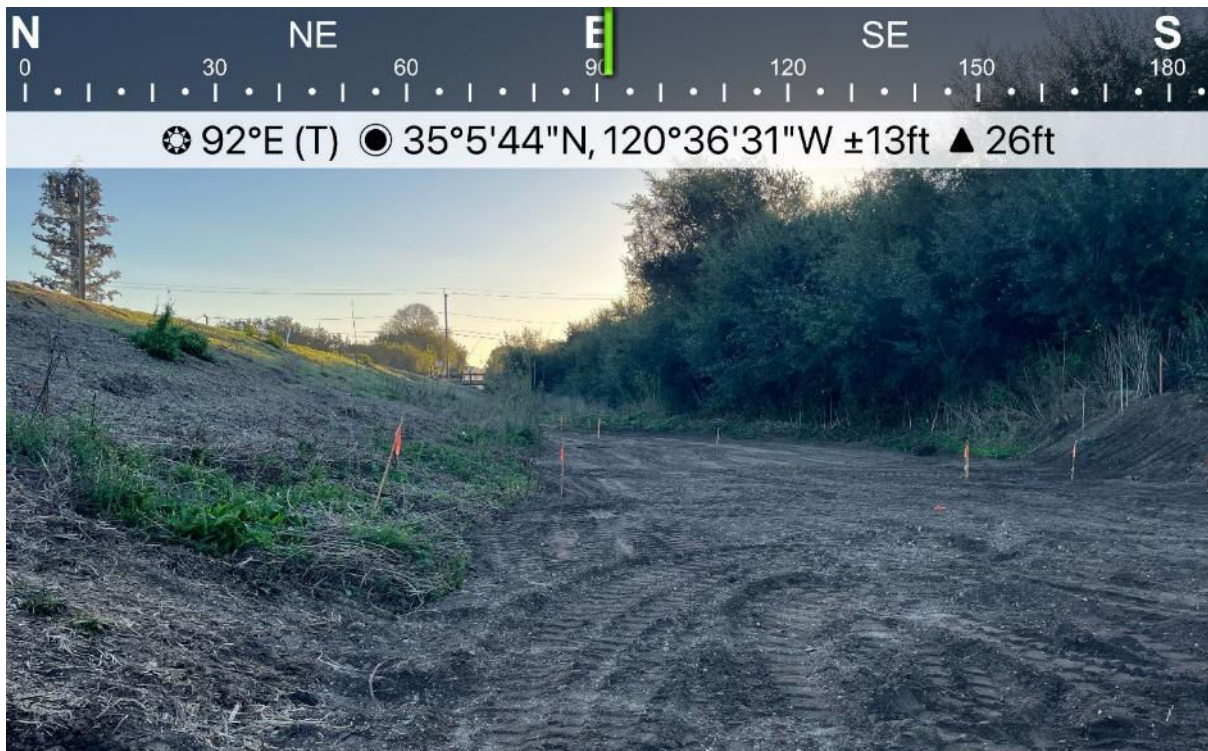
Looking east at the upstream diversion dam and diversion pipe running under the UPRR Bridge. October 21, 2025.
